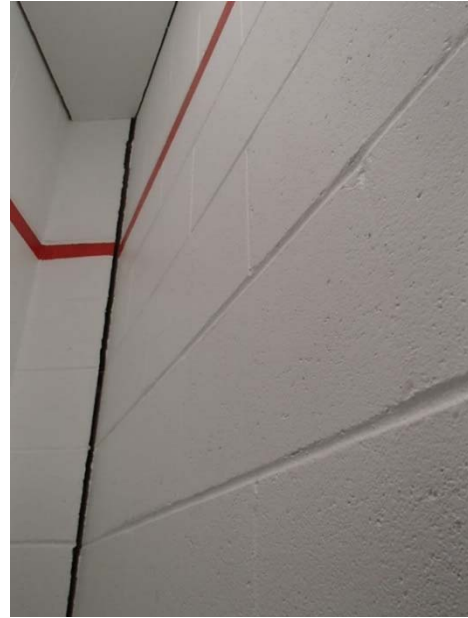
A. Masonry distress at window opening in north wall of Room A164.
